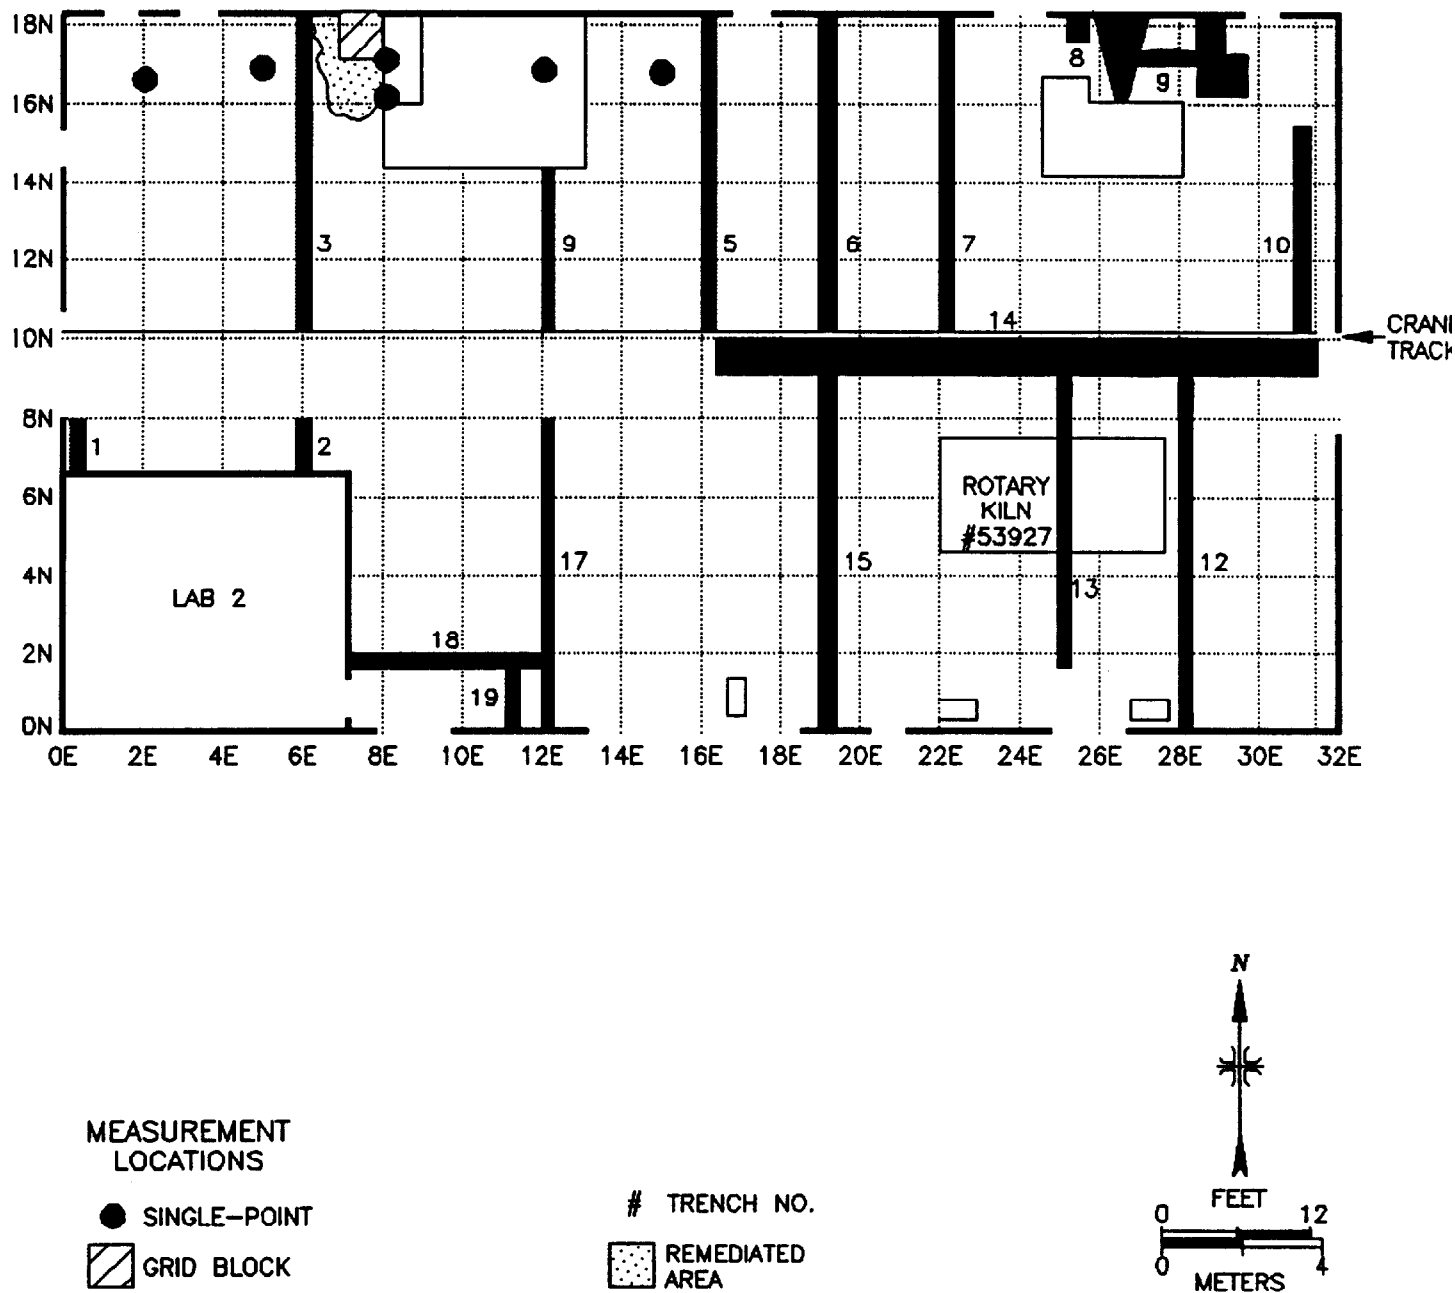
Building 23, Lab North Floor – Measurement Locations
